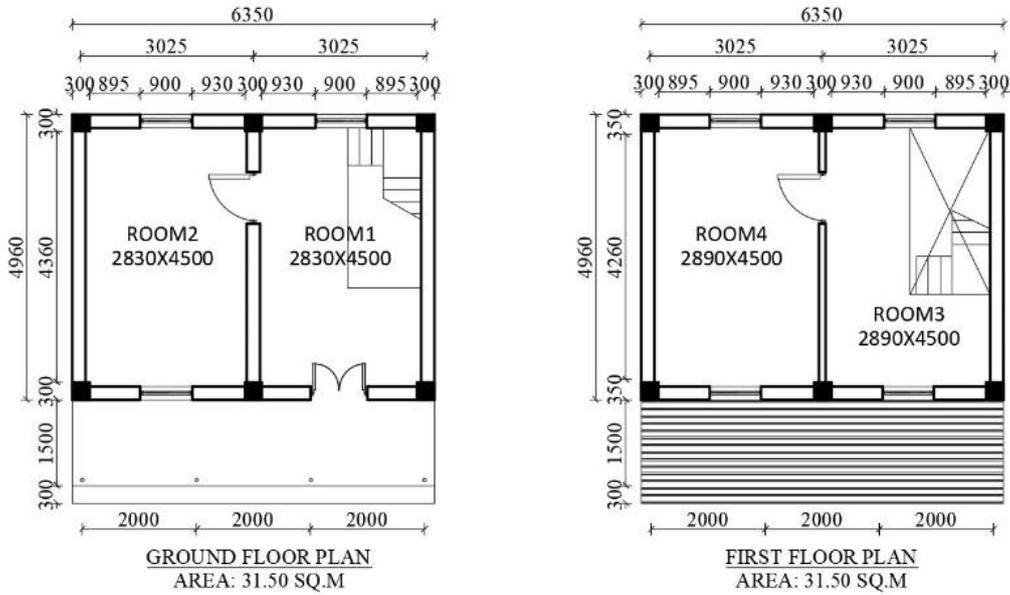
Ground floor and first floor plan BMC 2.1 RCC
